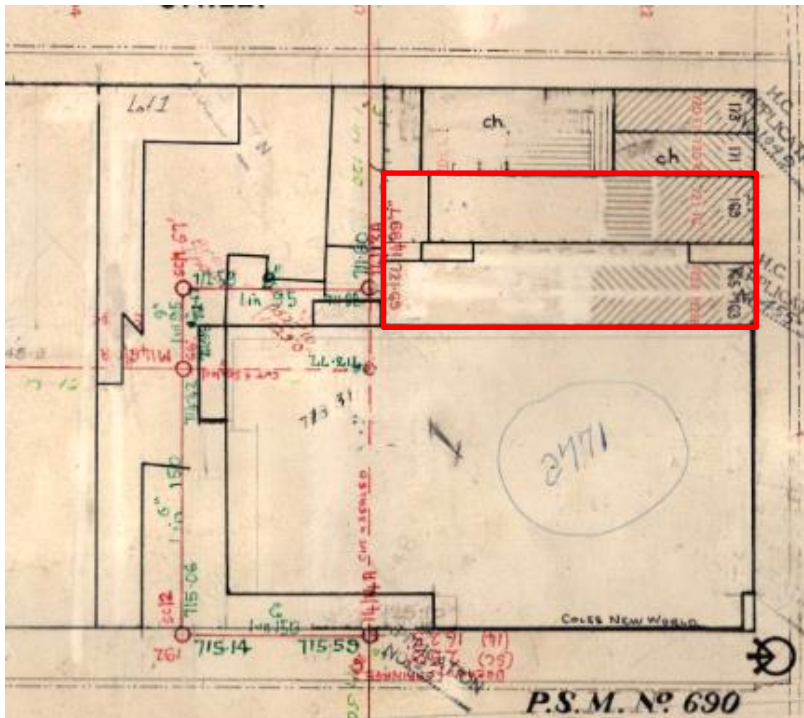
80–84 Mitchell Street (in red outline) at it appears in the sewerage plan from 1923. (Source: Bendigo Sewerage Authority Detail Plan No. 39, 1923)
